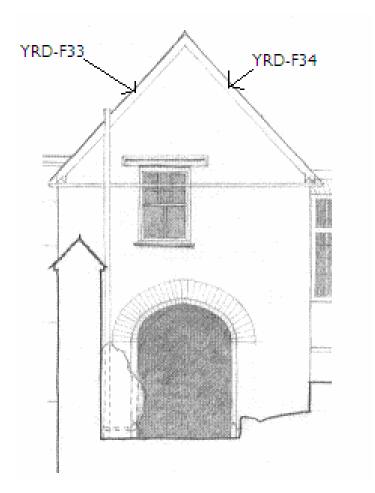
West-facing section D–D through the porch, showing the location of samples YRD-F33 and YRD-F34 (Architecton, position of section shown on Fig 16)
